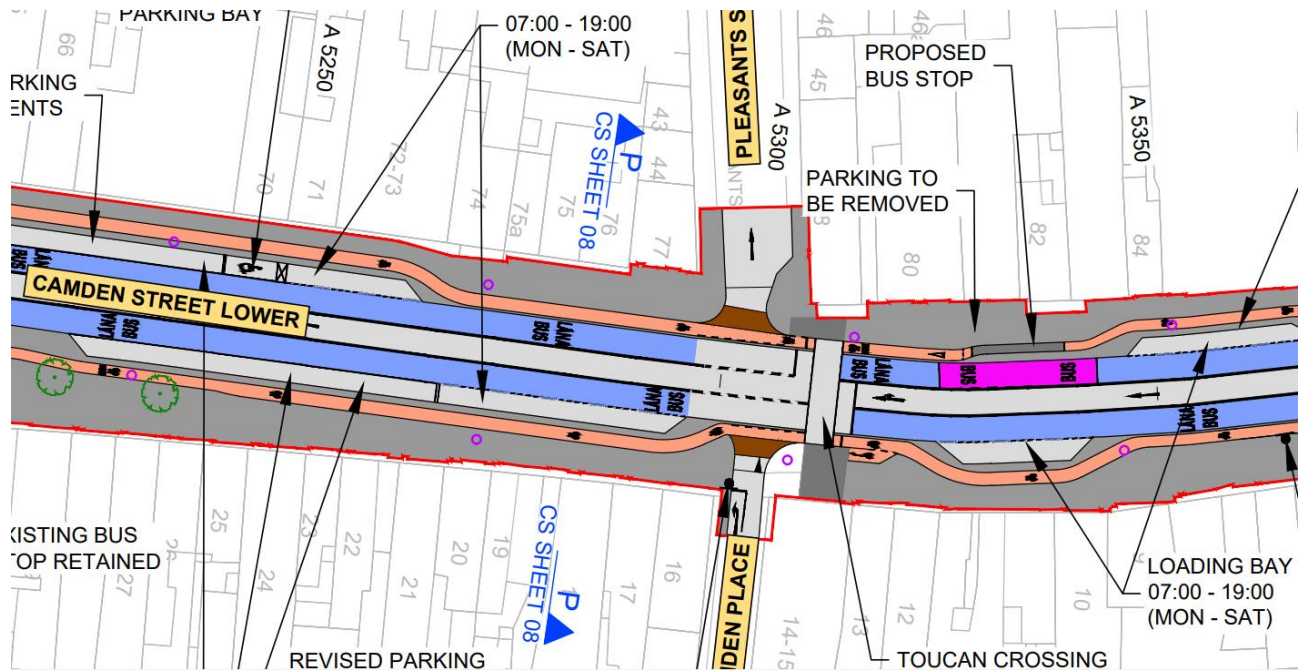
Extract from General Arrangement Drawings at location of cross-section P-P
